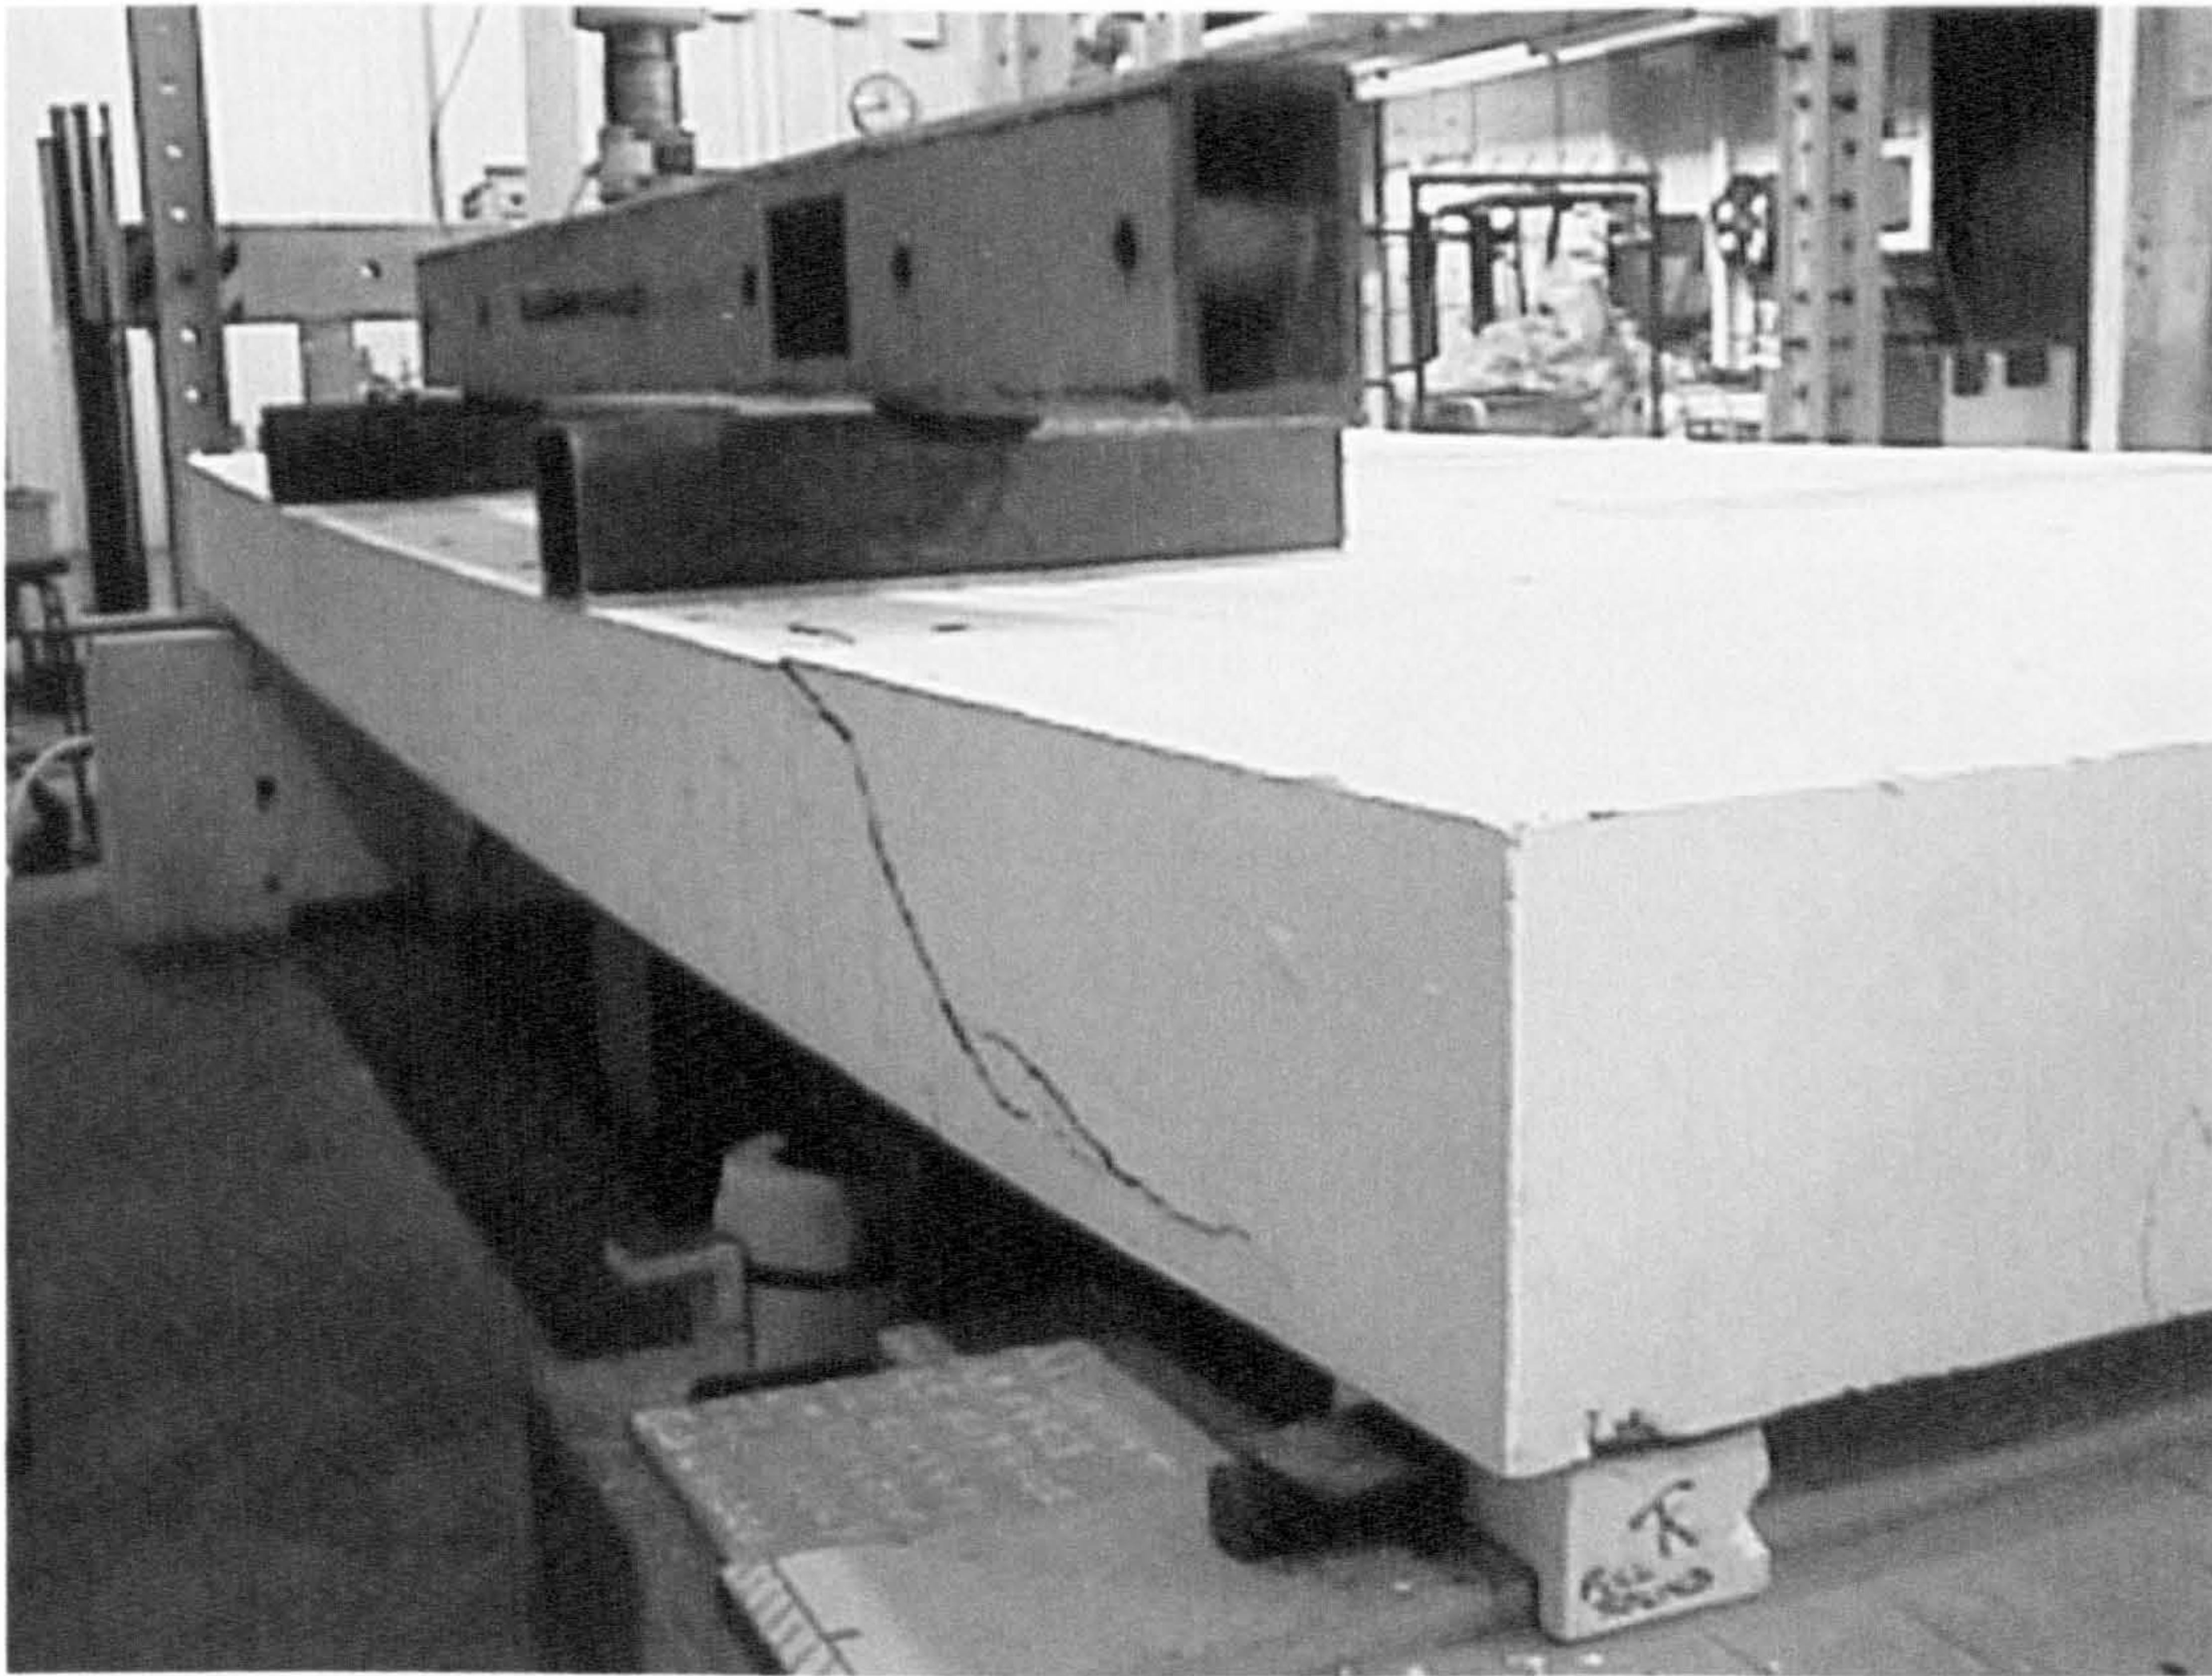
Deck 4 shear failure in outer beam under asymmetric loading
